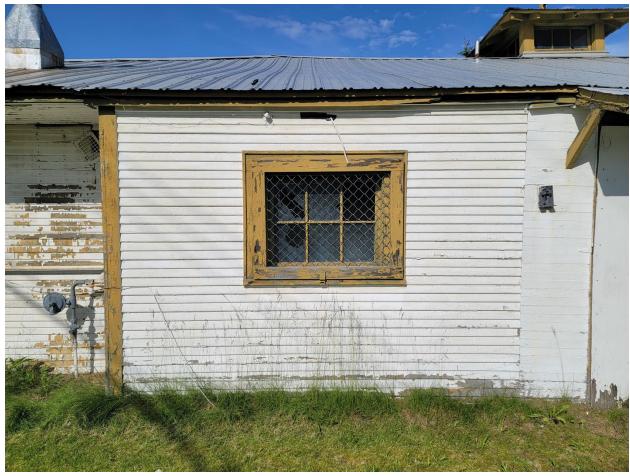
Detail photograph of the window in the stairwell of Building A (©TNSDS 2023).
